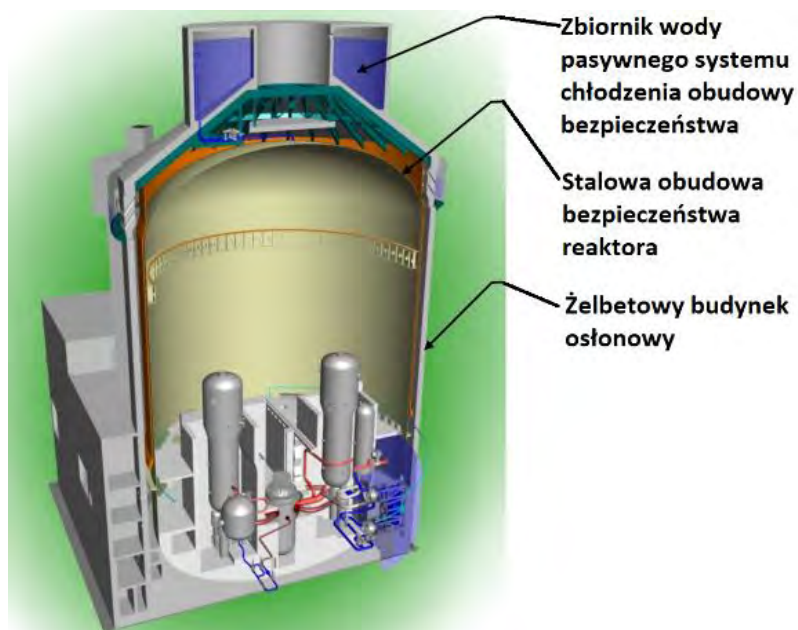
9 Cross-section of the containment building and shield building of the AP1000 reactor
